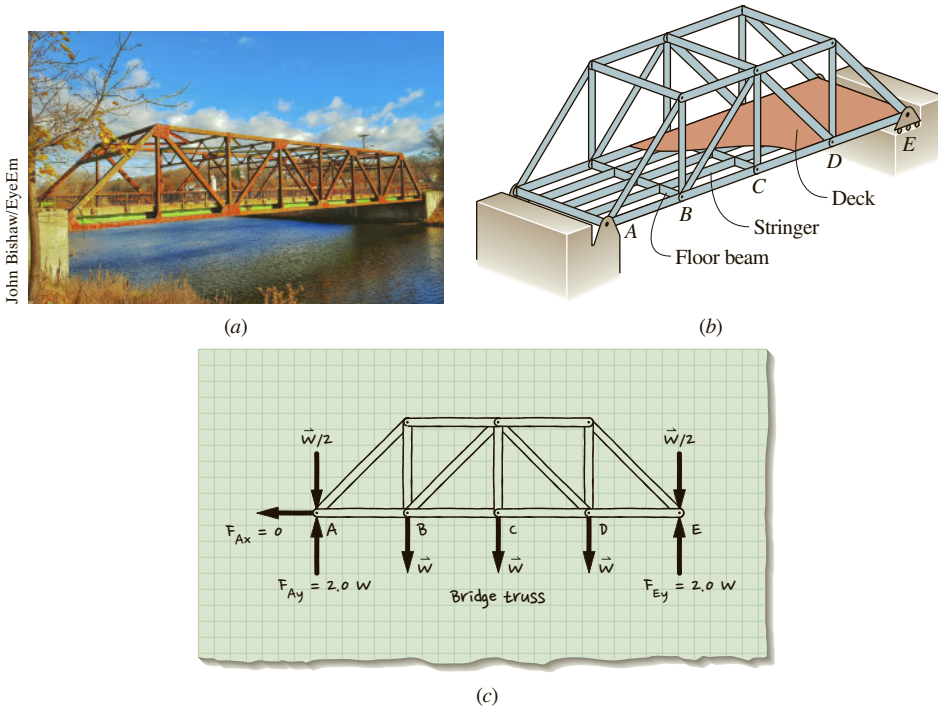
(a) An example of a truss bridge; (b) Schematic of a truss bridge; (c) Free-body diagram and analysis of truss support forces.
